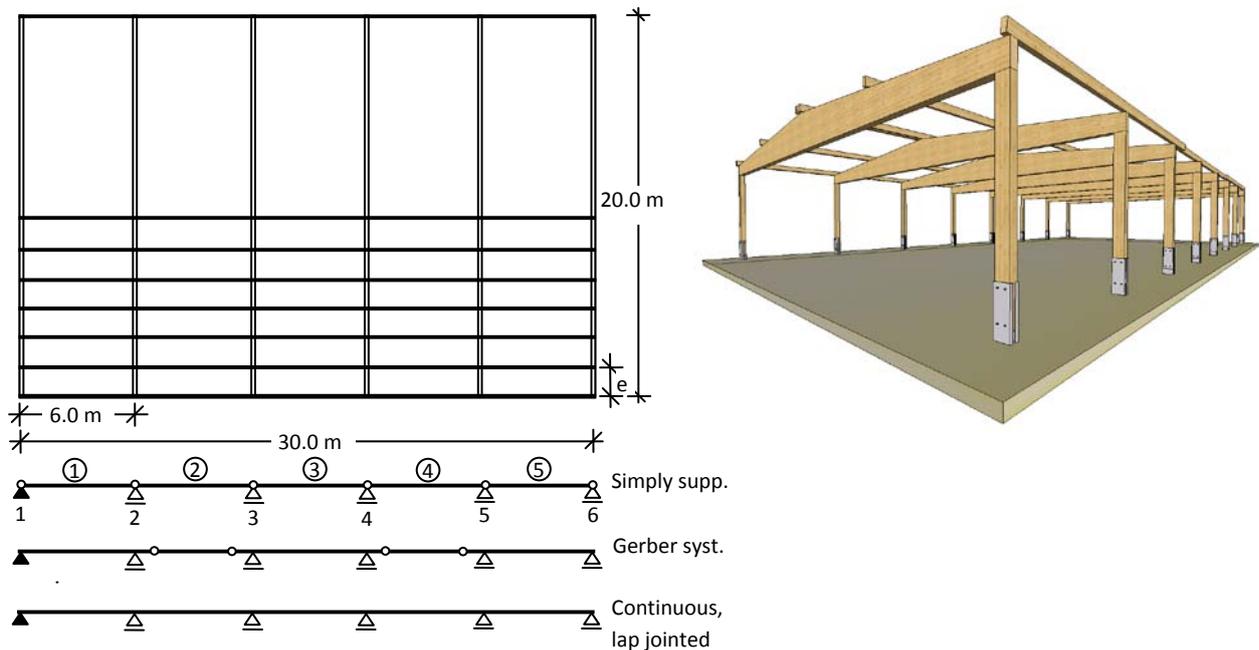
Schematic layout and isometric drawing of structure and possible structural systems
